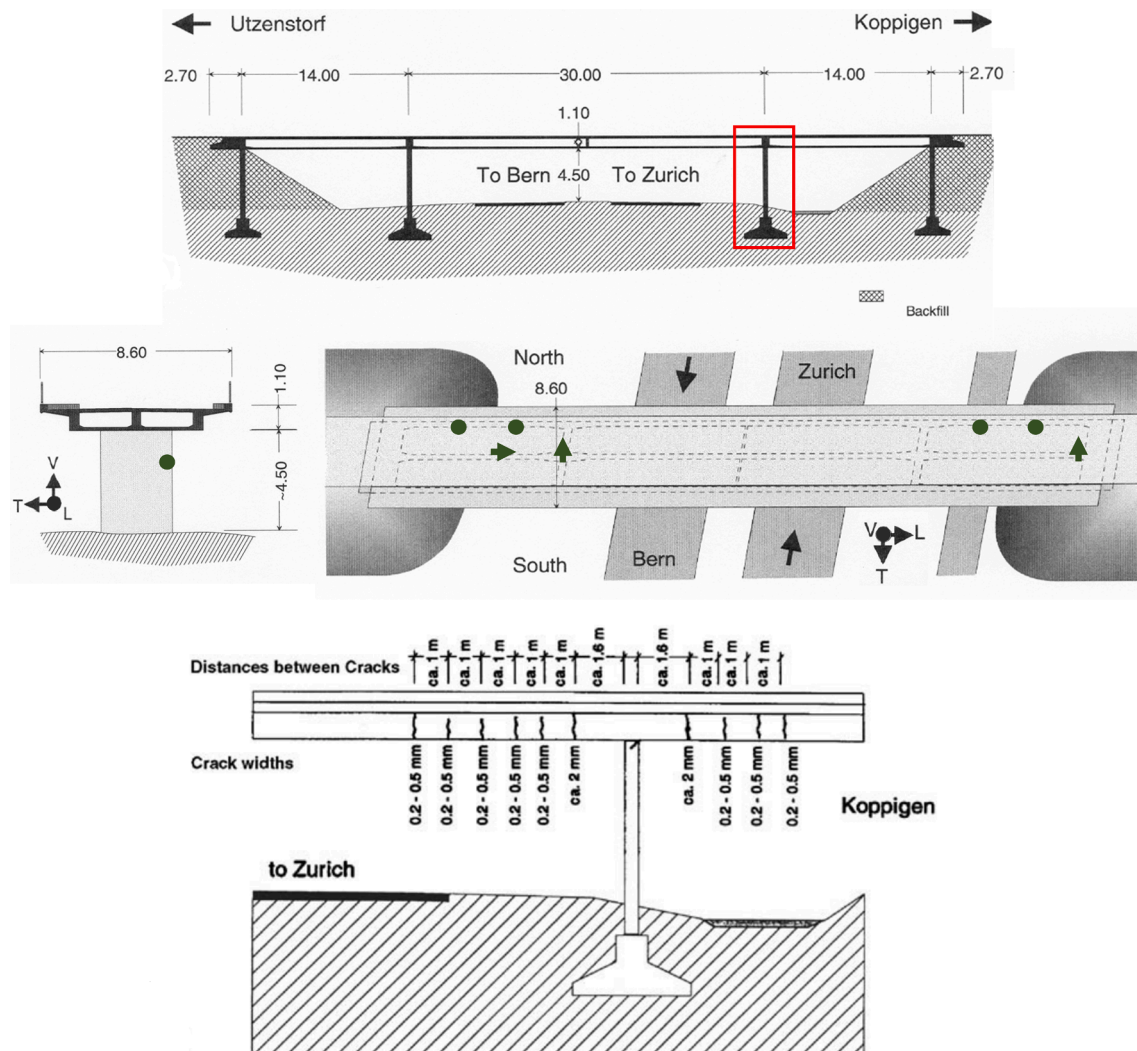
The Z24 bridge case study. From top to bottom: frontal view (the red frame indicates the damaged pier); side and plan view; crack pattern. The green arrows indicate the sensors' location and direction. The global directions are longitudinal (L), transverse (T), and vertical (V) as shown in the reference frame. Adapted from [44] and [45]. (For interpretation of the references to colour in this figure legend, the reader is referred to the web version of this article.)
